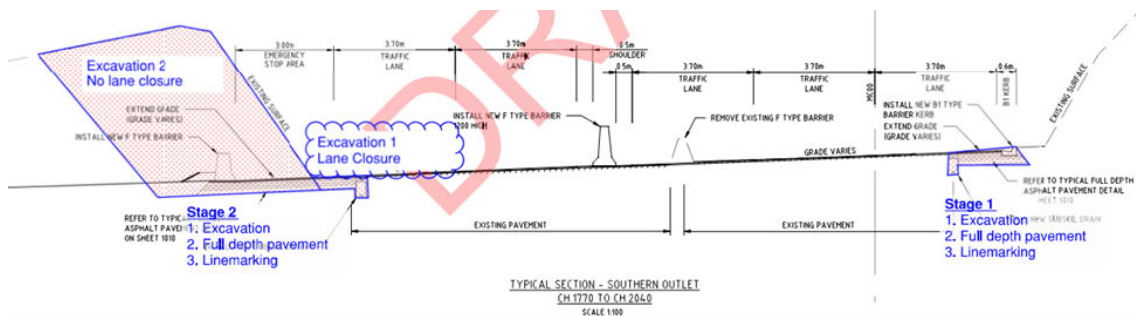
Typical section – Southern Outlet Ch. 1770 to Ch. 2040
